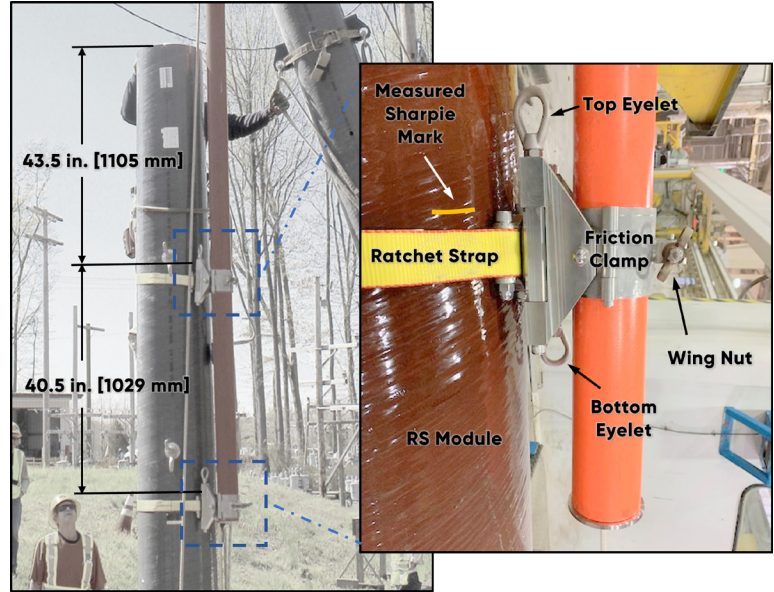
Gin pole mounts to RS module using two (2) clamp assemblies spaced 40.5 in. [1029 mm] apart.
